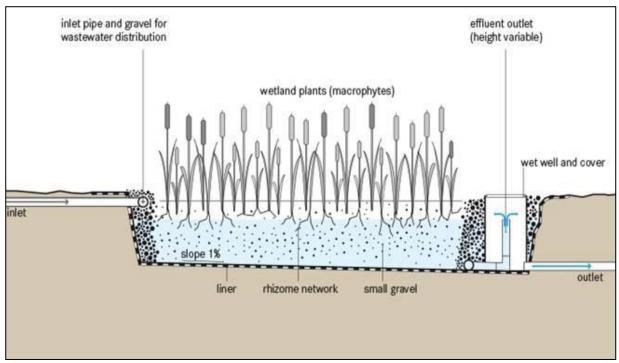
8 Schematic cross-section of a subsurface horizontal flow constructed wetland.
